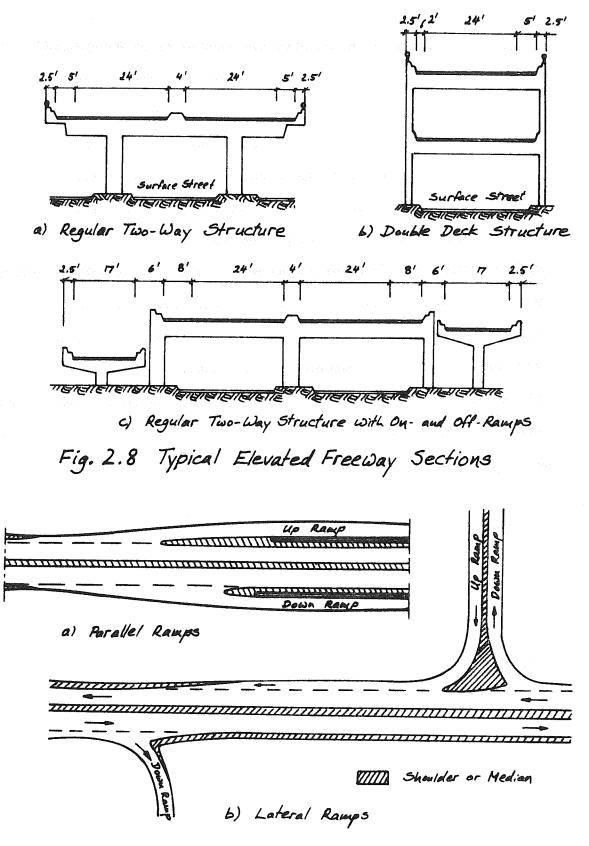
Typical Ramp Arrangements For Elevated Freeways
